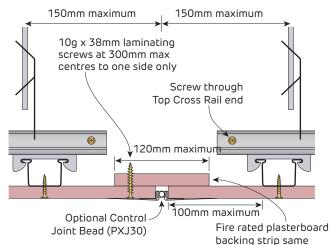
Seismic Control Joint thickness as ceiling Parallel to furring channel Section
